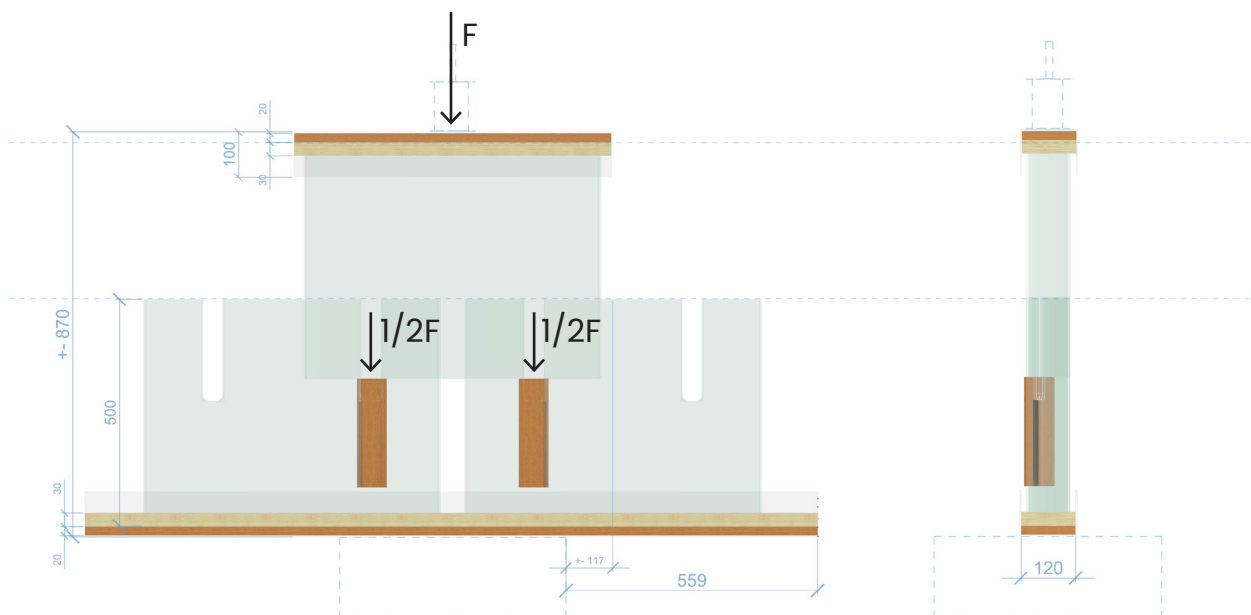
Front and side view with measurements of the laboratory test setup (own work, 2025)
